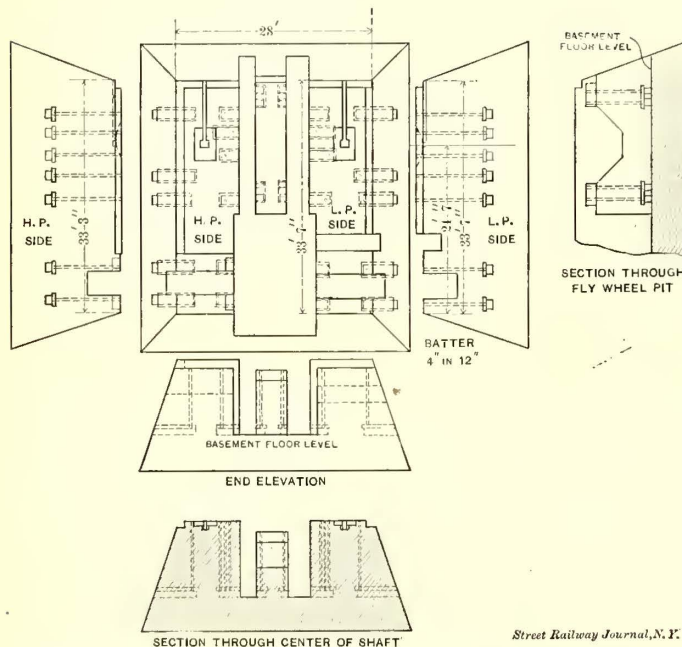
ENGINE AND GENERATOR CONCRETE FOUNDATION
